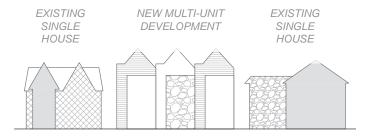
Facades should be articulated and no building should have a continuous plane of more than 10m, in order to integrate with the existing scale of the street
